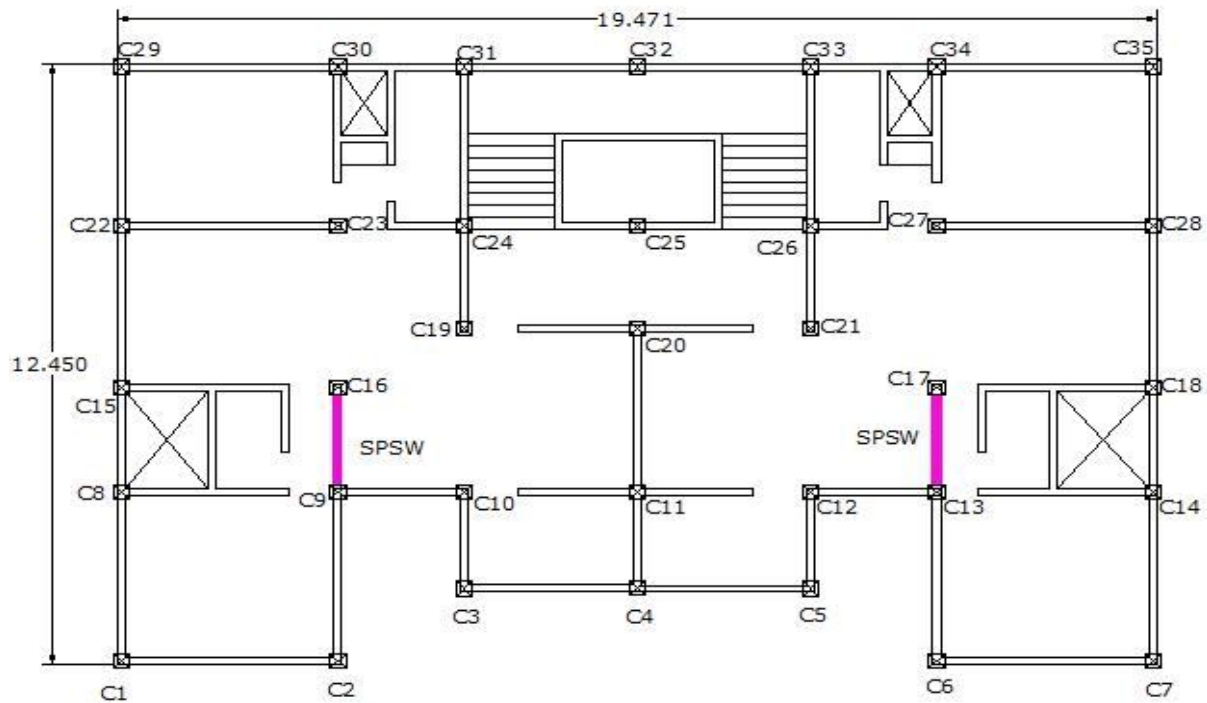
Plan showing Steel frame building with SPSW4 (Model 4)
